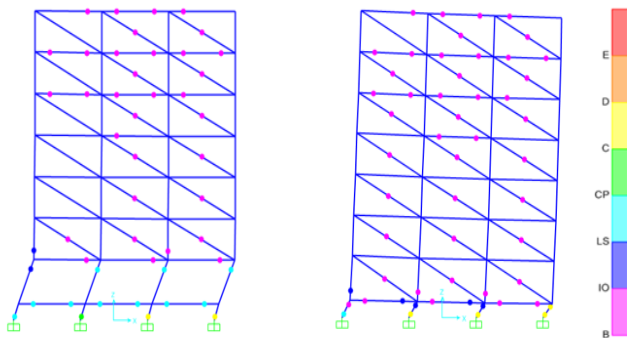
Failure mechanism of buildings with soft storey and without soft storey
